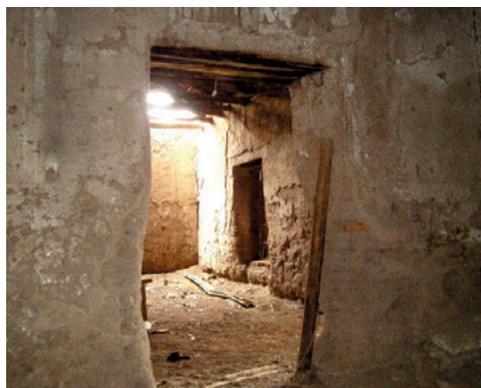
Casona Quilapilún adobe wall. (Source: Contreras & Jofré, 2016)
